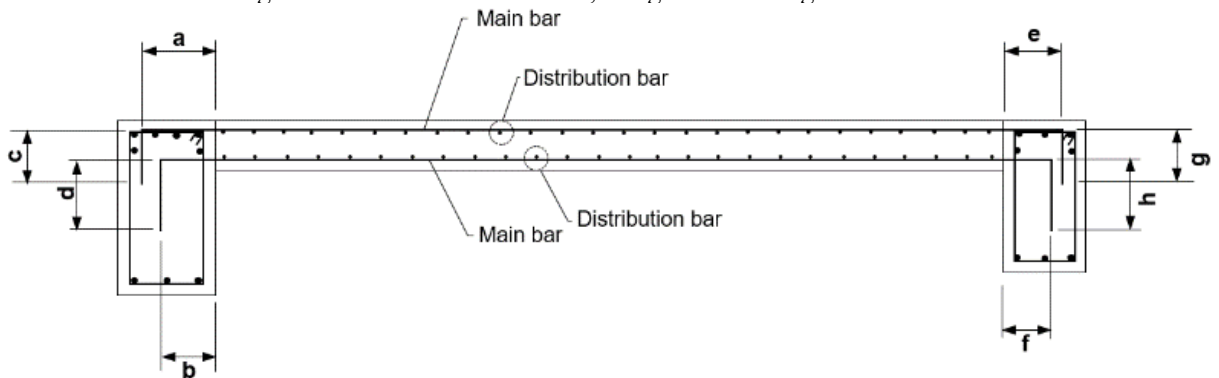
Anchoring of Slab Main bar (Both side fixed)
